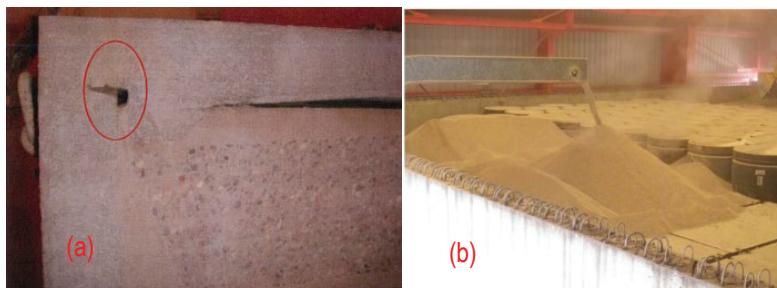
Cross-section through a concrete canister (a) and gravel filling around piles of canister in a large concrete structure (b)
